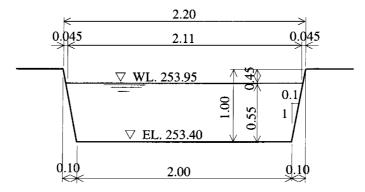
Cross section of beginning point of Main canal (Sta. 0 + 030)
